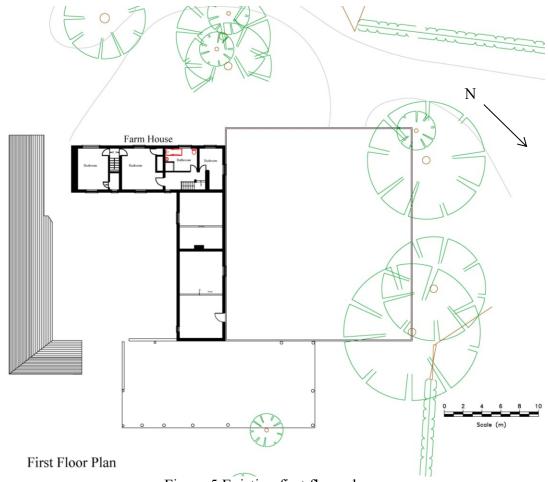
Existing first floor plan Modified from Corporate Architecture Ltd drawing
